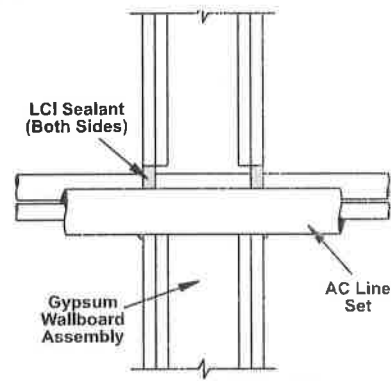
BARE & INSULATED METALLIC PIPES - Gypsum Walls
